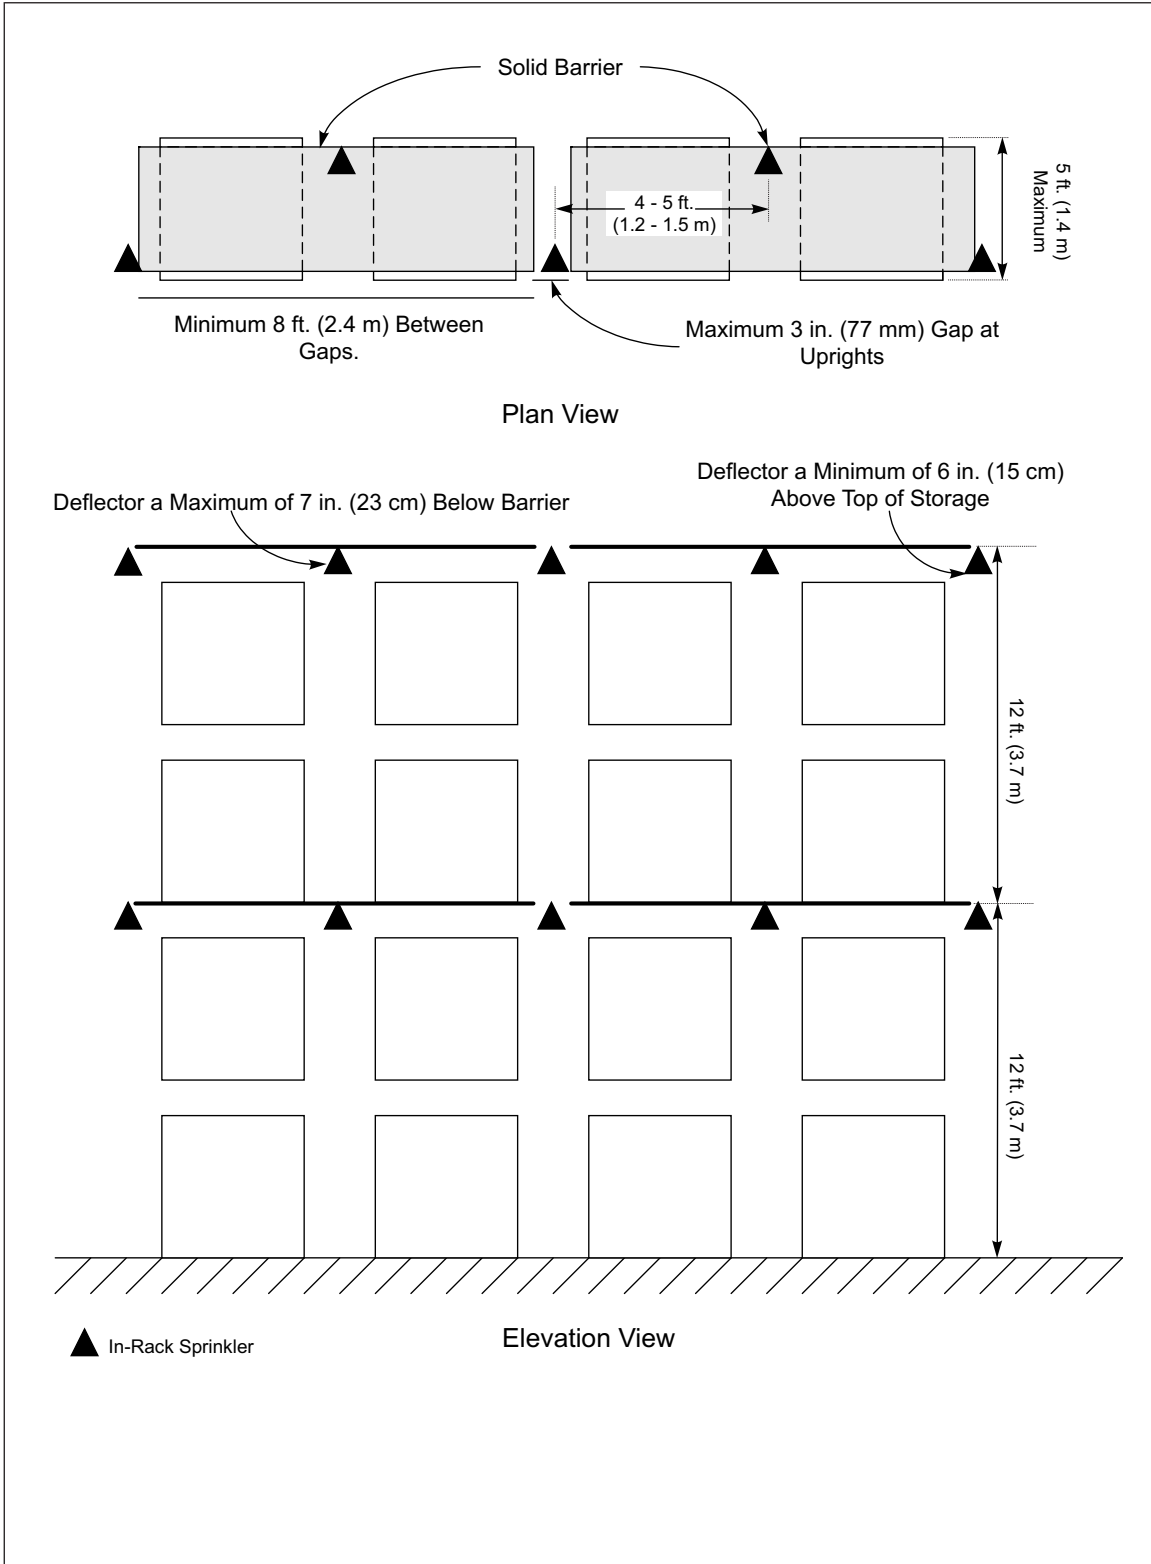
Single row rack in-rack sprinkler layout — Fire Protection Scheme A
